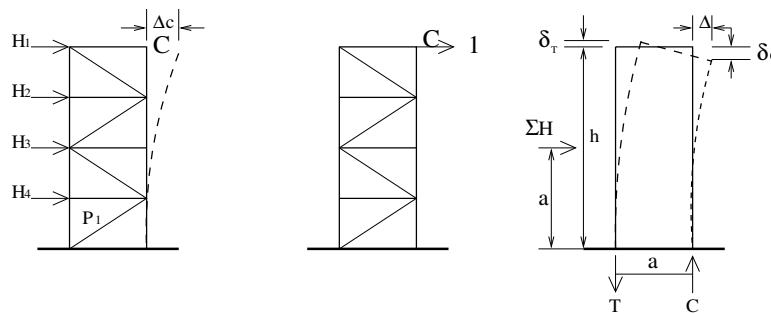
Axial Elongation and Shortening of a Truss Frame, (Lin and Stotesbury 1981)
